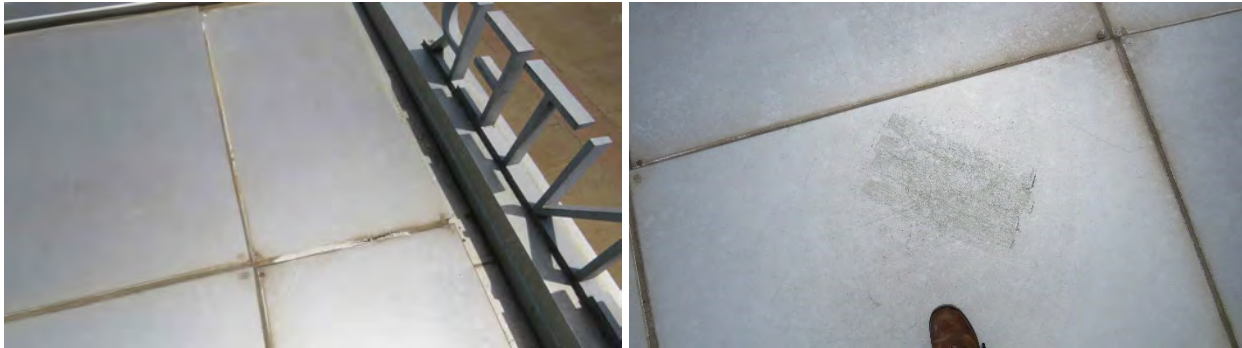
Roofing on the shrewmaker center for workforce tech (12) with no hail damage.
